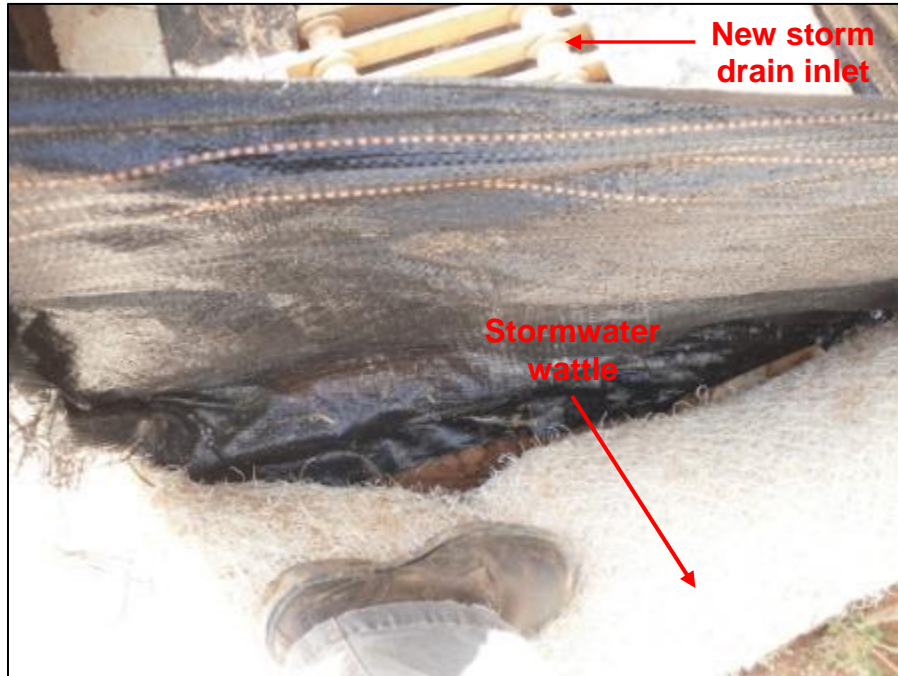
Alternate view of the area of the construction site depicted in Photograph 33.
